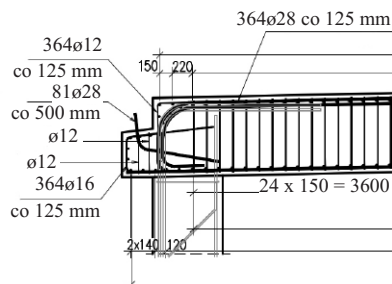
Detail of re-bars connecting foundation slab with d-wall – Łopuszańska Junction in Warszawa City
